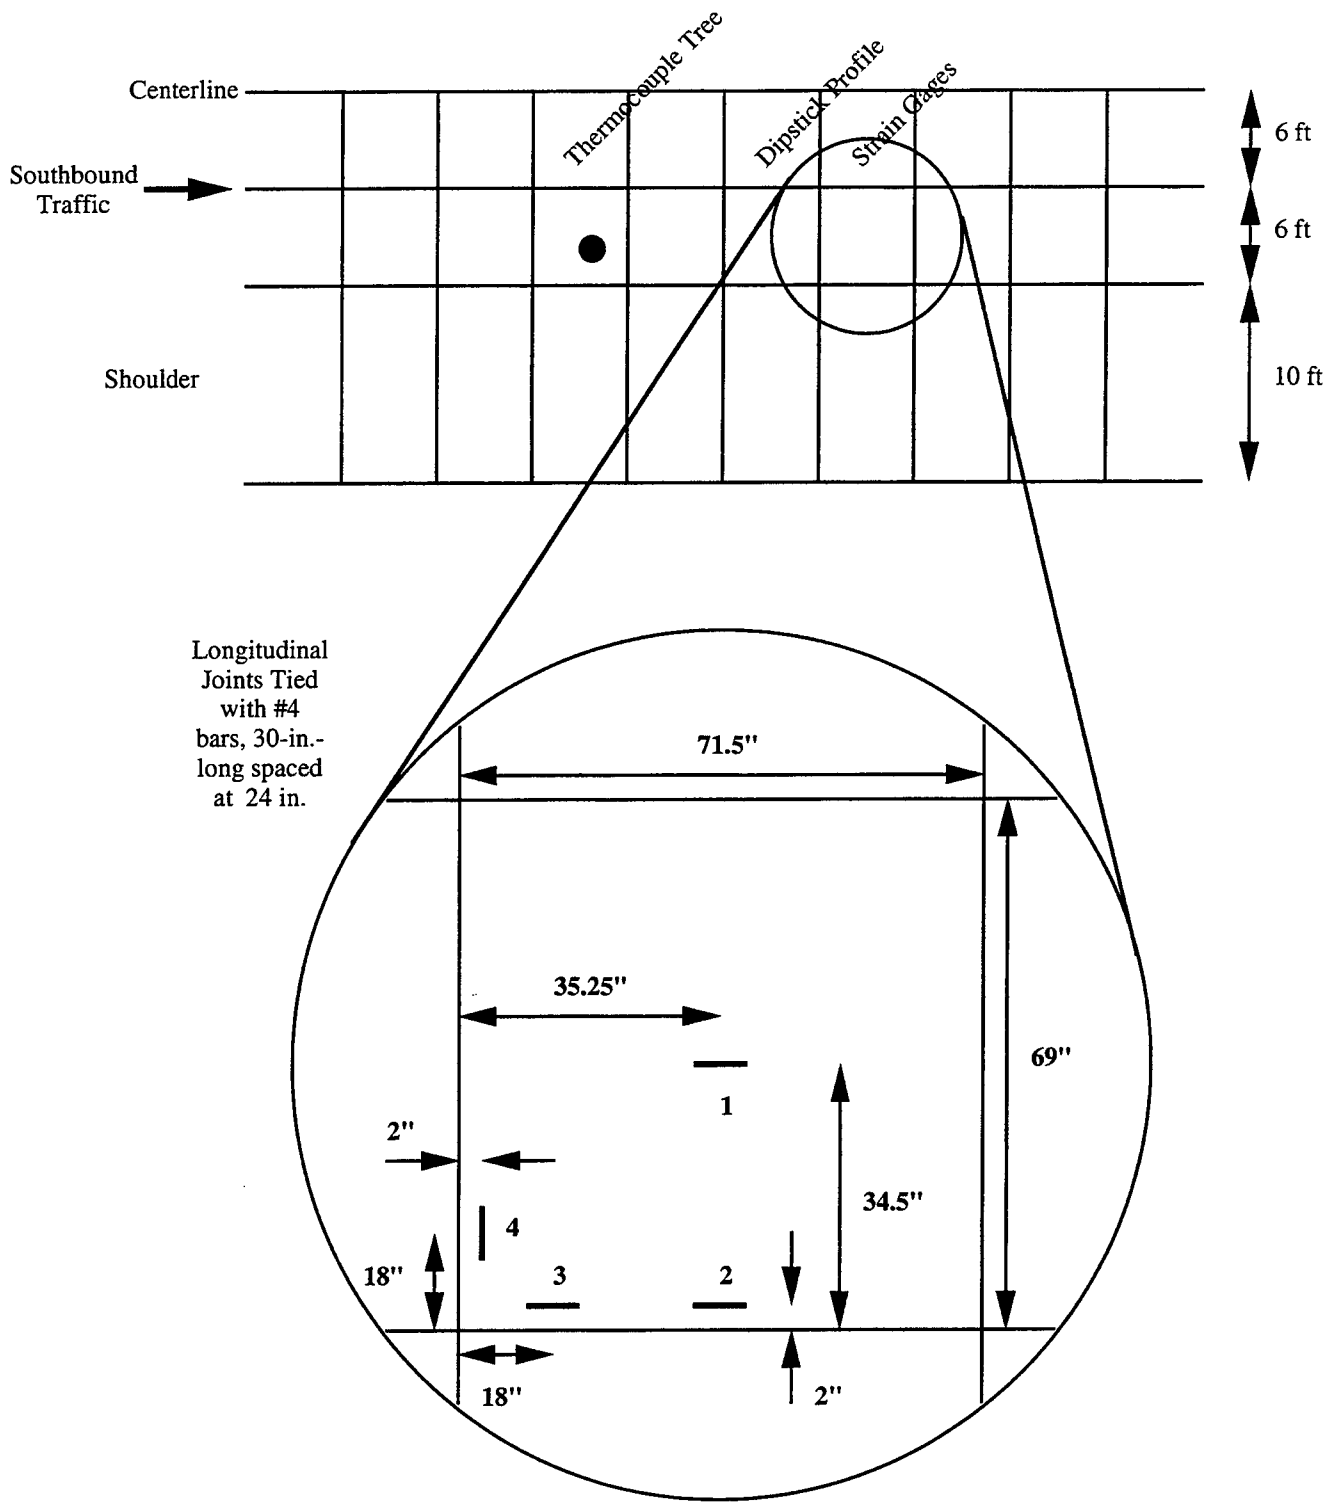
Test Slab F Layout for CDOT Project #3.
